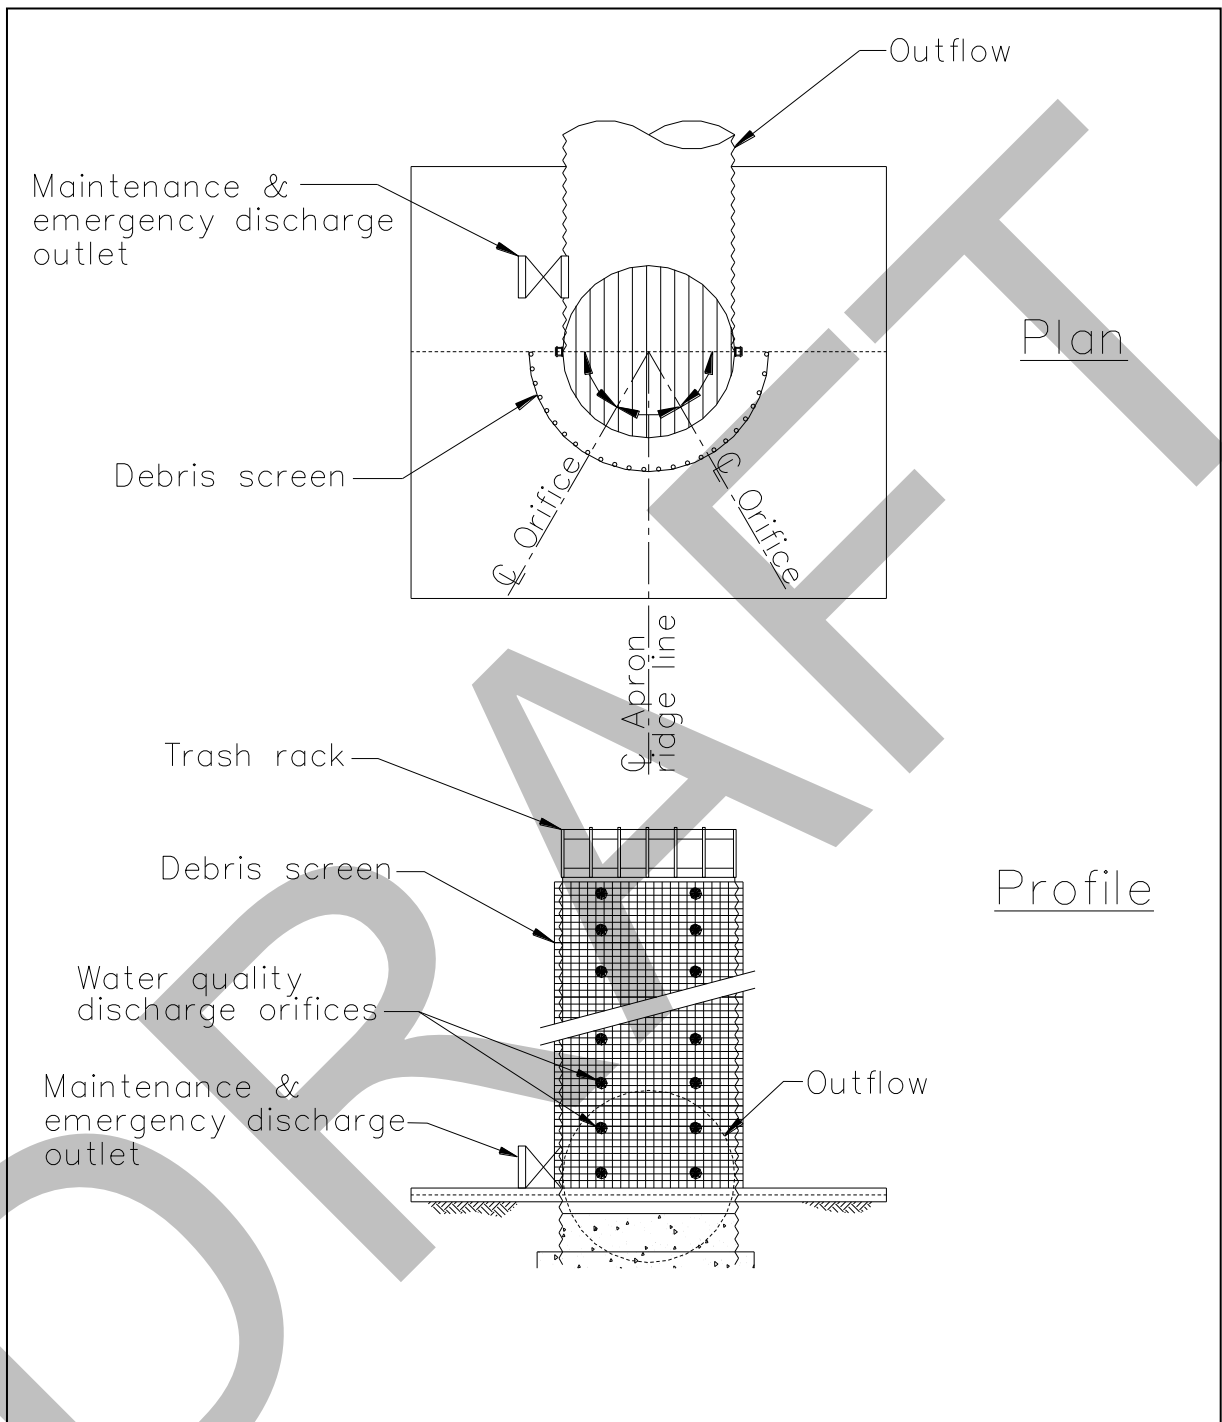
MULTIPLE ORIFICE OUTLET RISER
